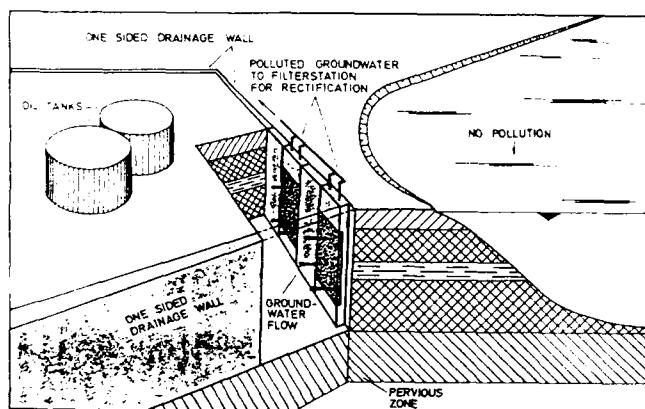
Drainage Walling as a Security Measure with Oil Tanks
